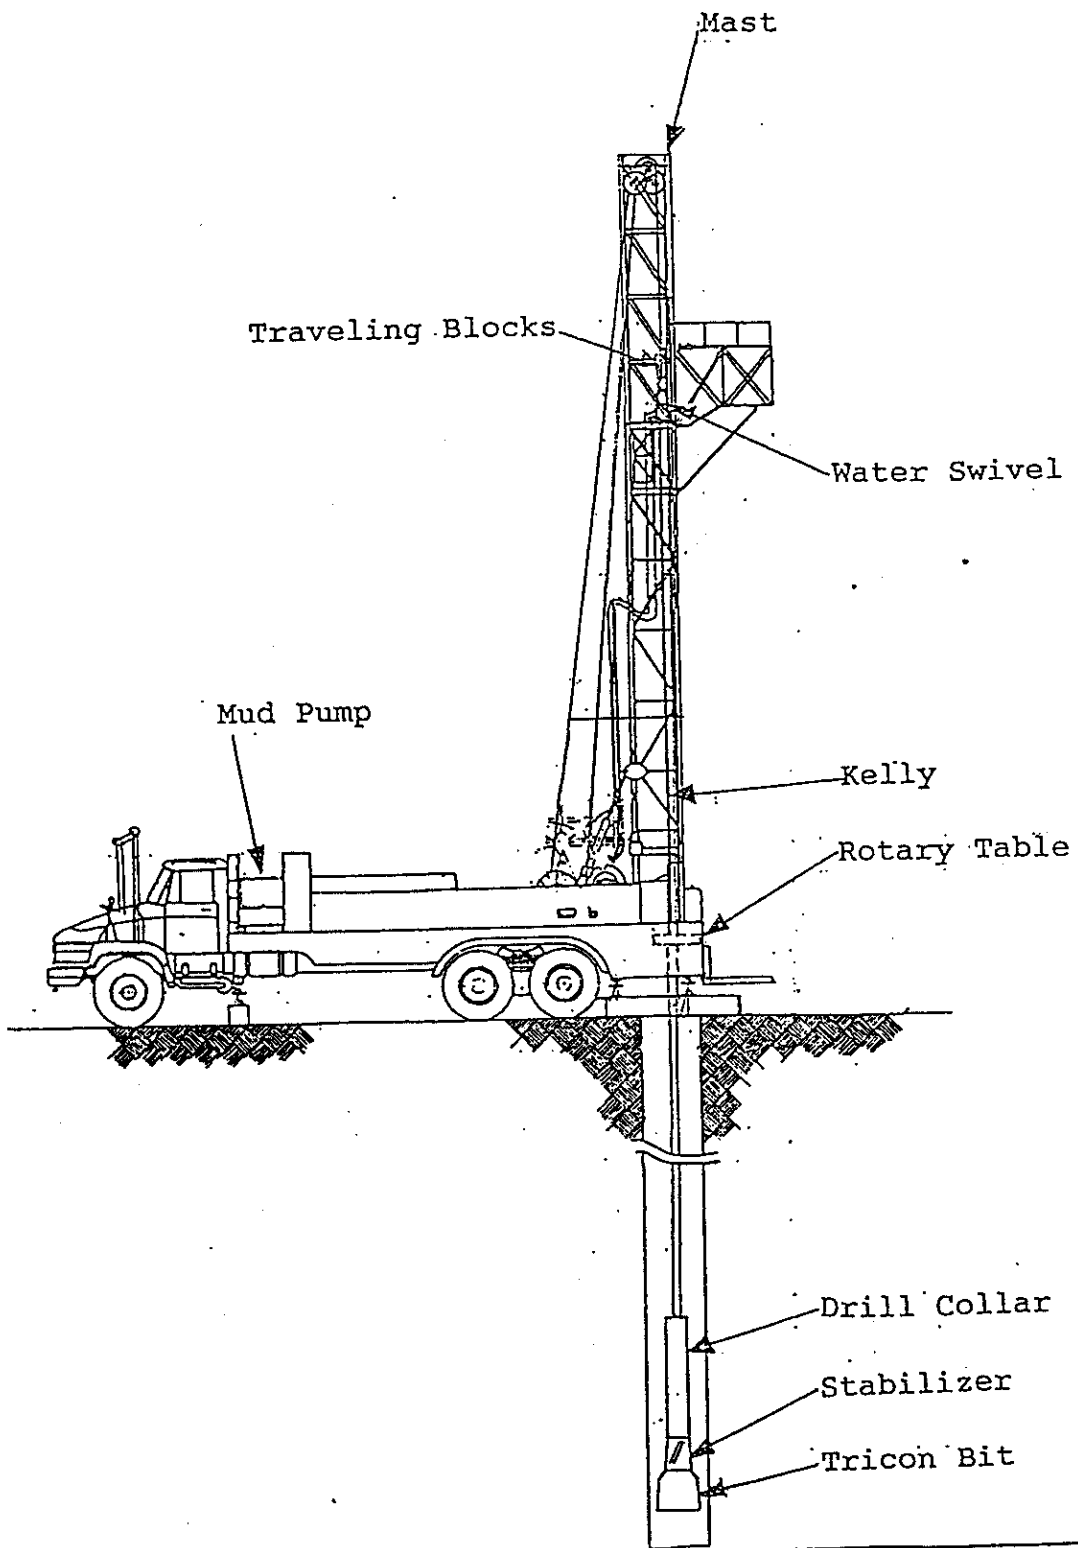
ROTARY TABLE TYPE DRILLING MACHINE
